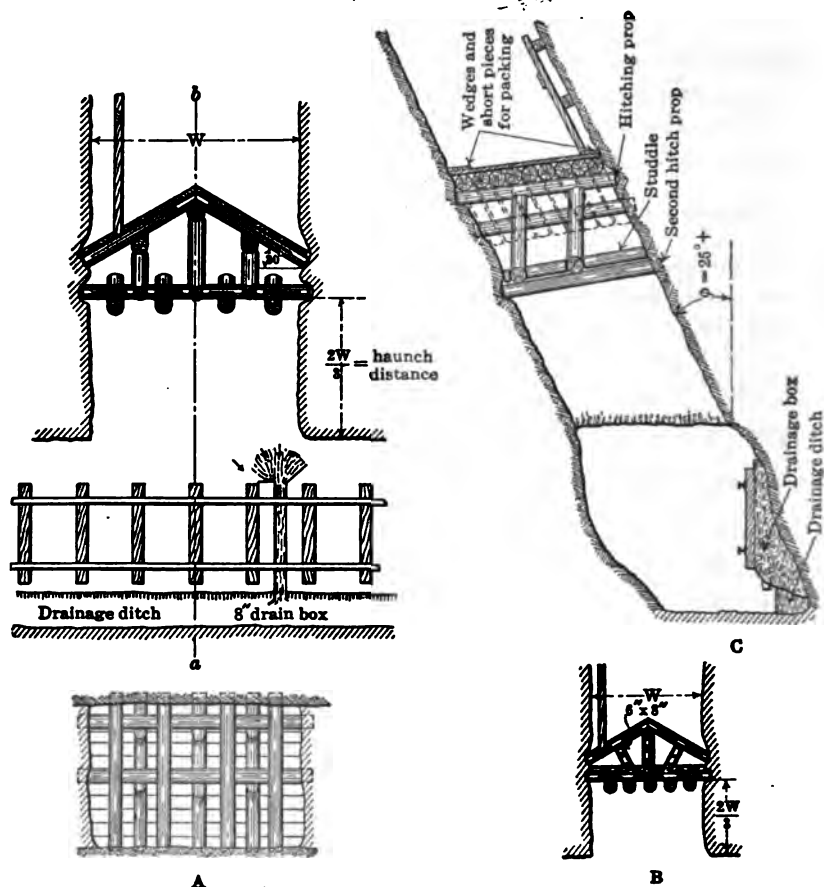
Bulkhead for pitch workings. A, plan view and front elevation; B, plan view of modification of bulkhead shown in A; C, side elevation at ab.
